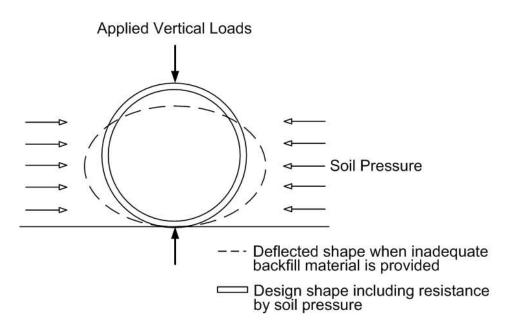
Flexible Culvert: Load vs. Shape
